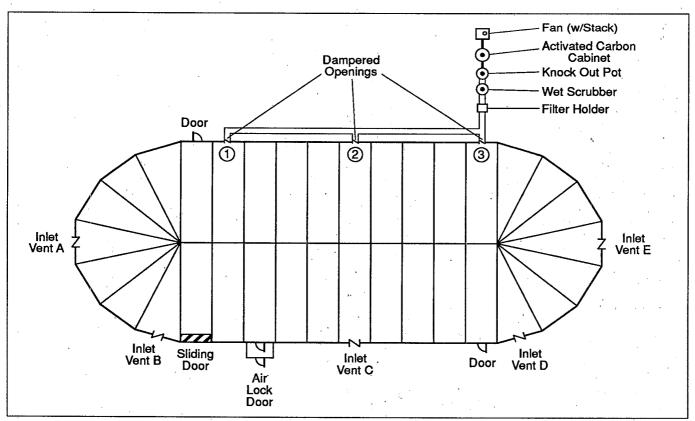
General Arrangement of Ventilation Air Cleaning Equipment.
